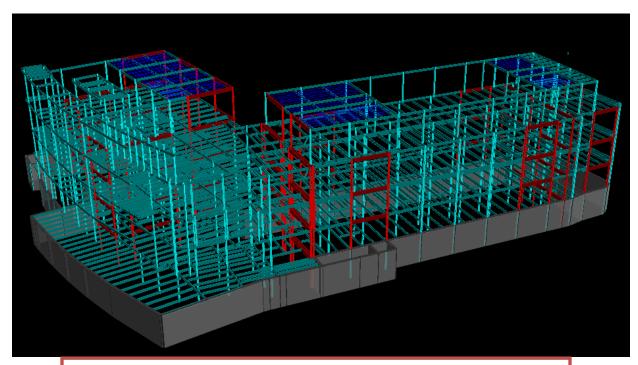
RAM 3-D View of Structural System with Lateral Bracing Highlighted (Northwest corner)
